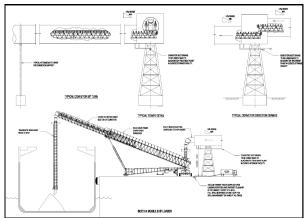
Proposed plan for the Stage 1 conveyor system to Berth 4
